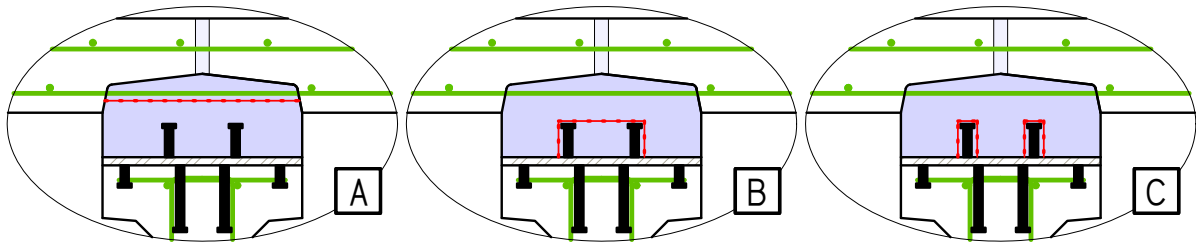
Graph. Minimum shear planes for horizontal shear transfer in the UHPC composite connection of the emulated steel girder portion of the test specimen.
